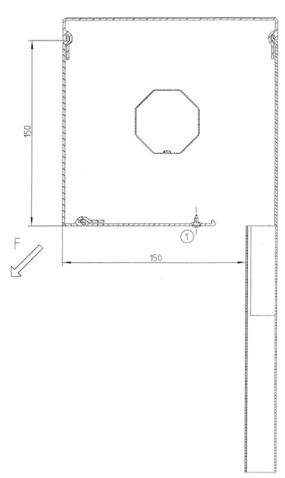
Example of fixed part of a shutter: head box of a roller shutter
